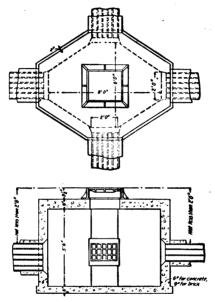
Vault Size 8 to be Used on Runs of 13 to 24 Ducts of Conduit when Intersected.
